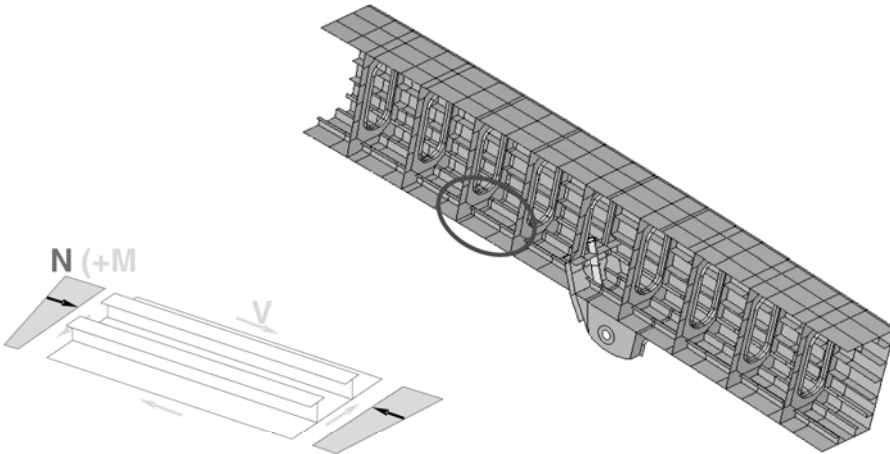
Longitudinally stiffened plate element in arch and supporting bar Joint #1.
